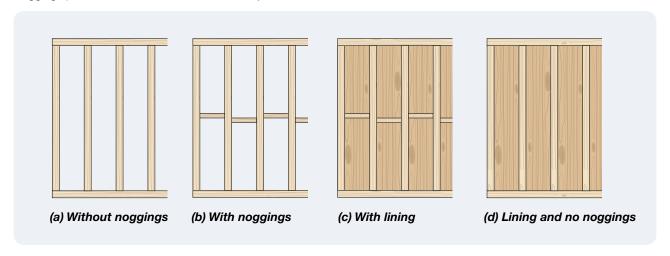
Use of noggings in lightweight timber-framed walls.
